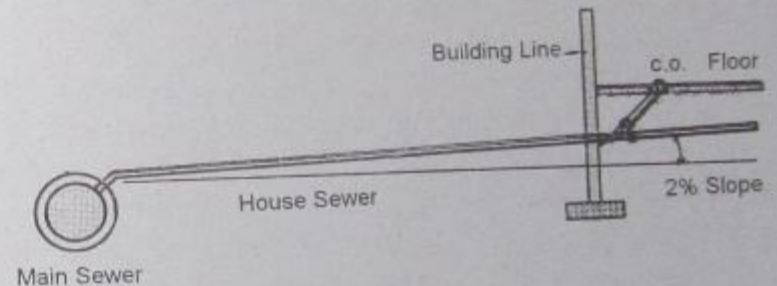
HOUSE SEWER CONNECTION TO THE MAIN SEWER
